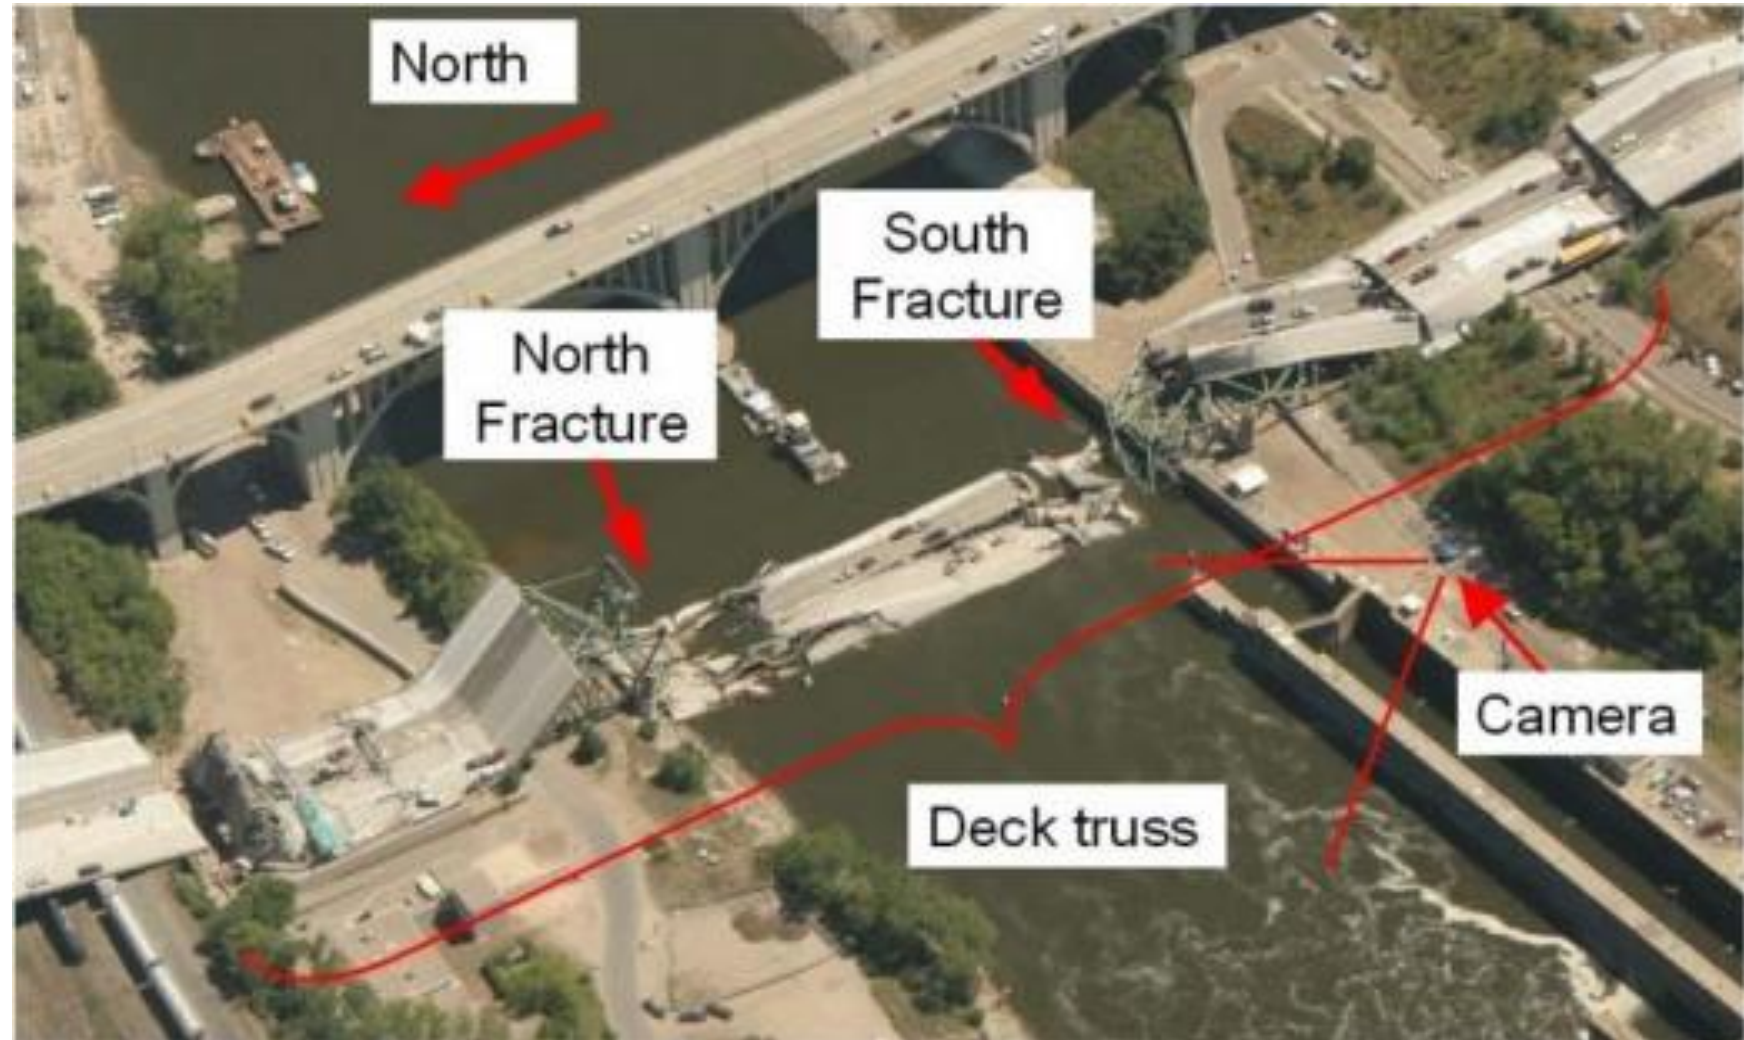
The collapsed deck truss portion of the I-35W bridge.
